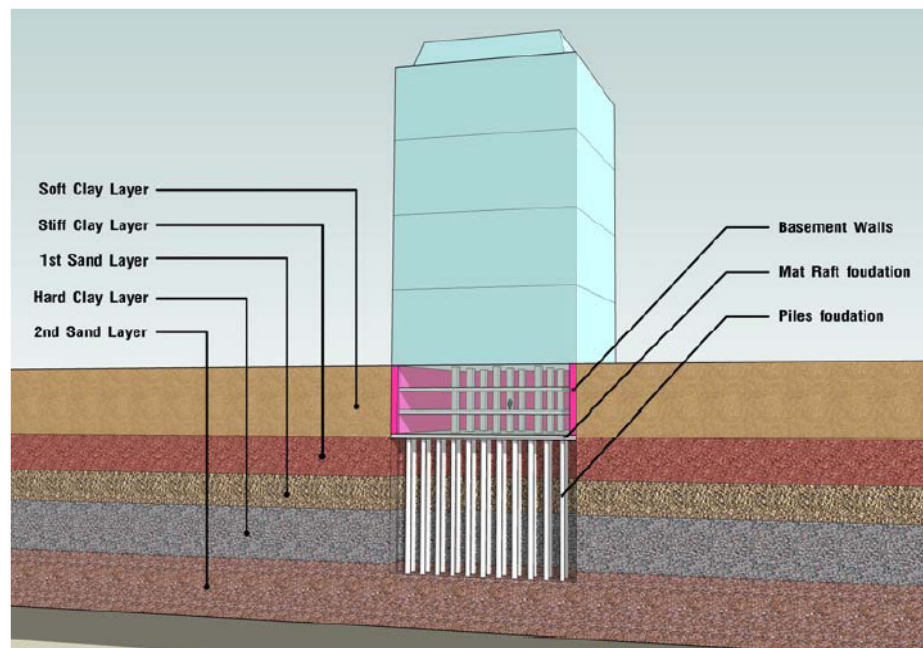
3D layout of the piled raft foundation under superstructure (Phongpat Kitpayuck, 2009)
